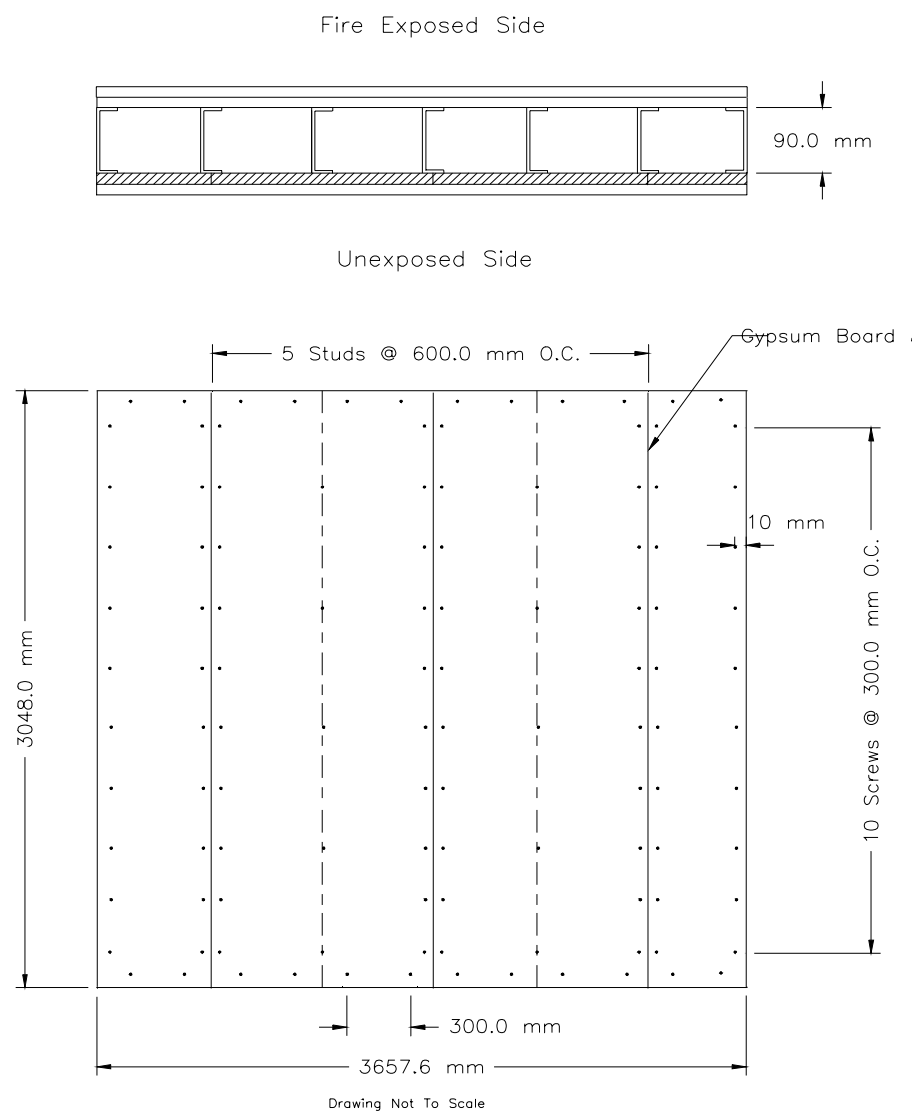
Screw Locations For Steel Stud, 2x2 Gypsum Board Layers, Full-Scale Assembly (Base Layer, Unexposed Side)
